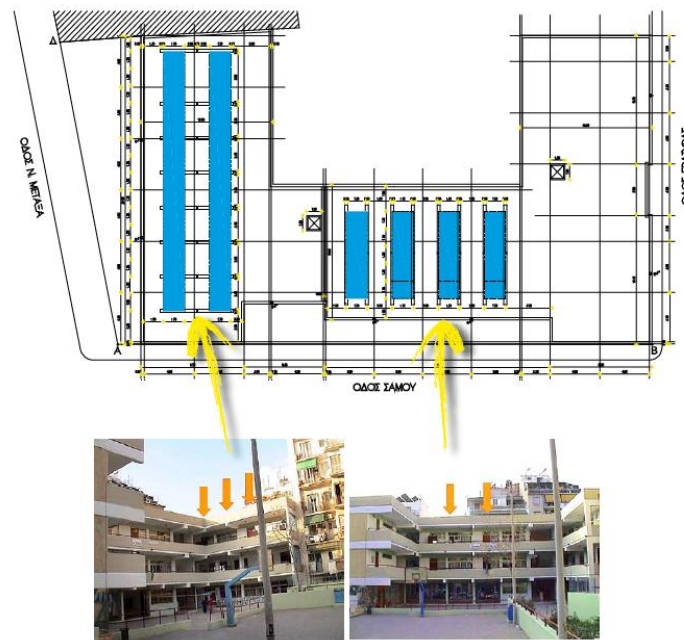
Roof plan depicting the photovoltaic panels [15]
